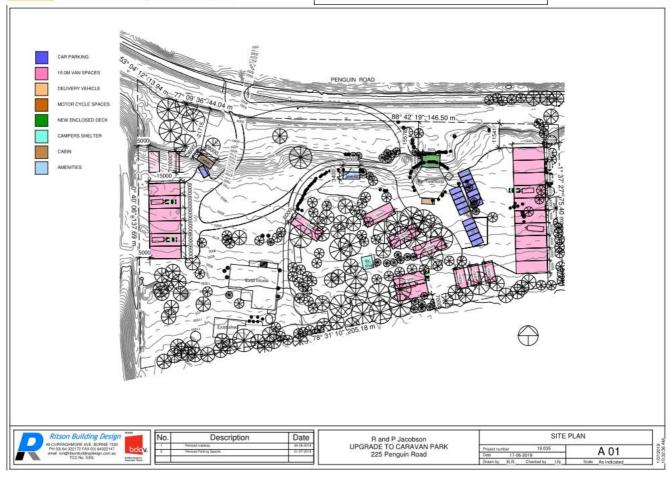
Image Showing site layout of proposed caravan park and holiday cabin
